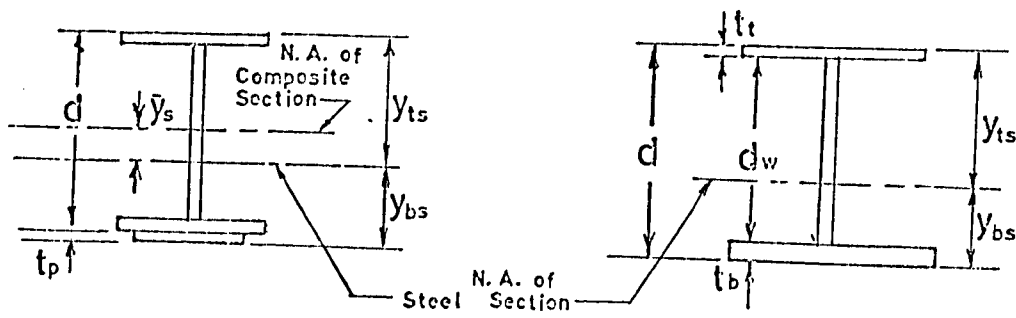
ROLLED BEAM WITH COVER PLATE FIG. 3-2 PLATE GIRDER
